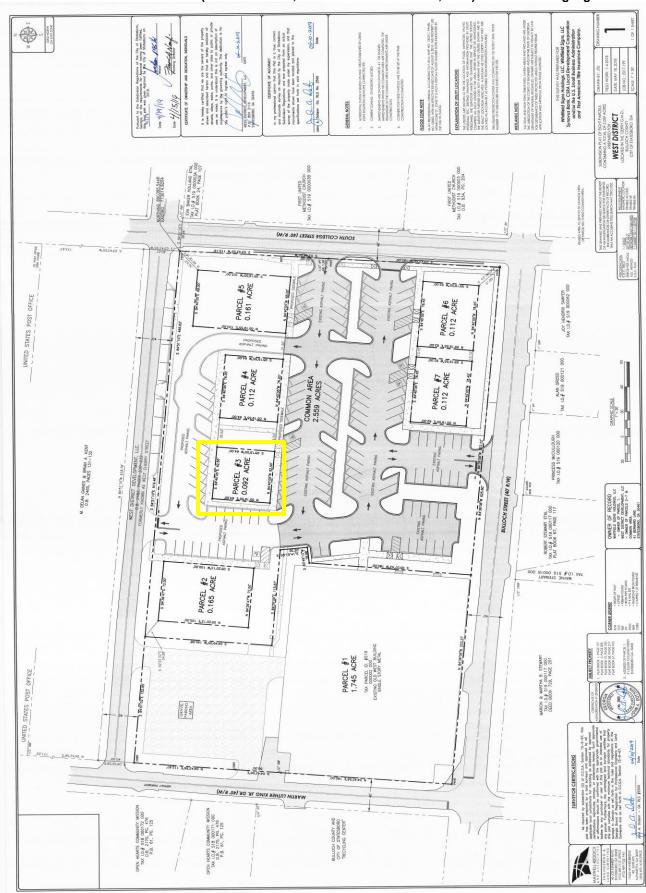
EXHIBIT D: PROPOSED SITE PLAN (DATED MAY 18, 2018/REVISED APRIL 10, 2019) RZ 19-04-04 Highlighted
